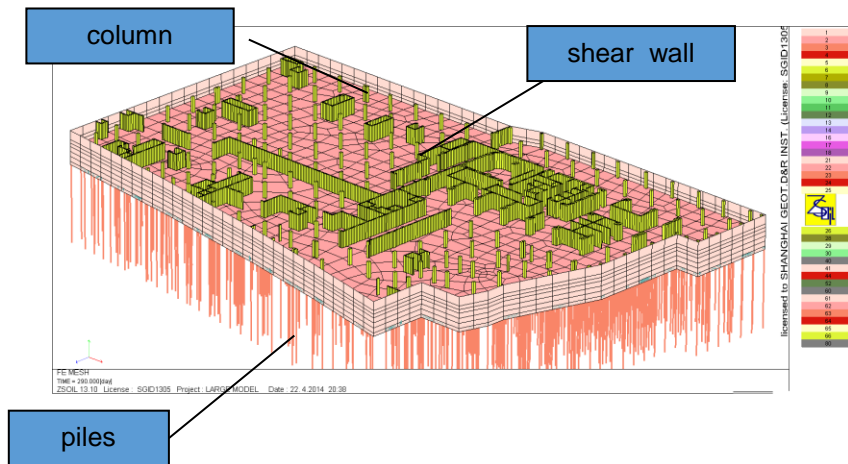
FE model of underground structure and pile foundation of BaoHua project
